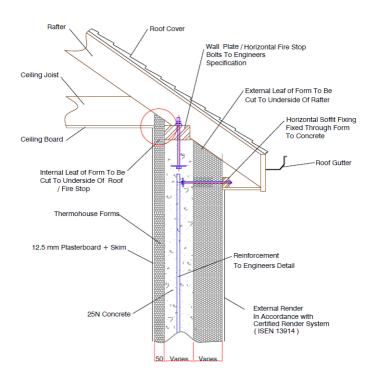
Timber Cut Roof Top Mounted Wall Plate
